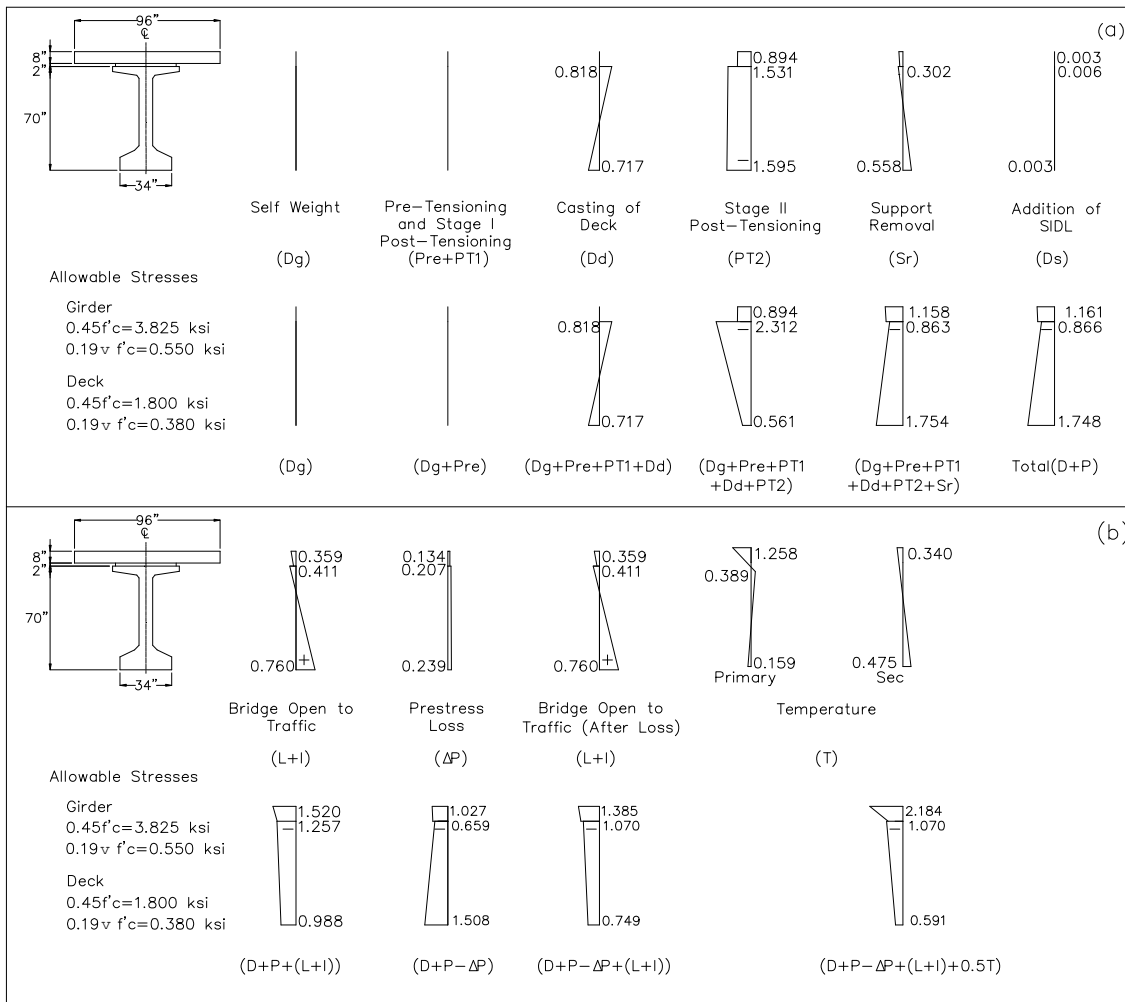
Stress Check at Section D-D (Splice in Interior Span) for (a) Construction and (b) In-Service before and after Losses.
